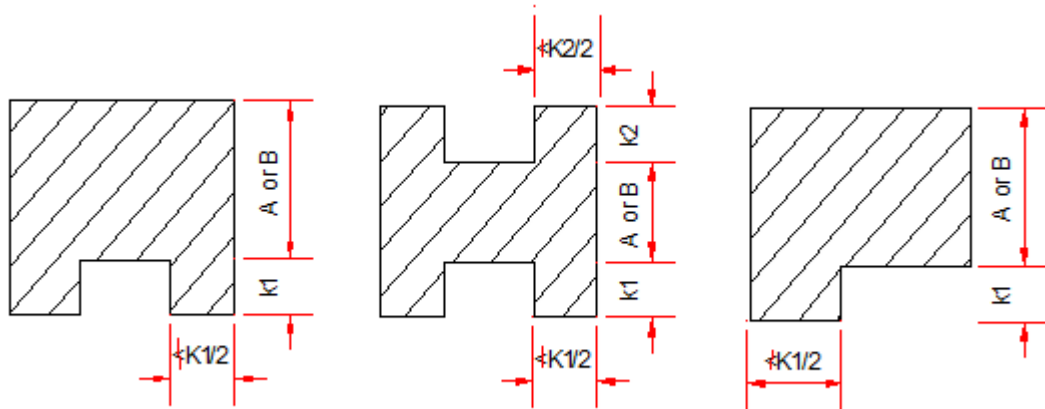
RESTRICTION ON PLAN PROJECTION
